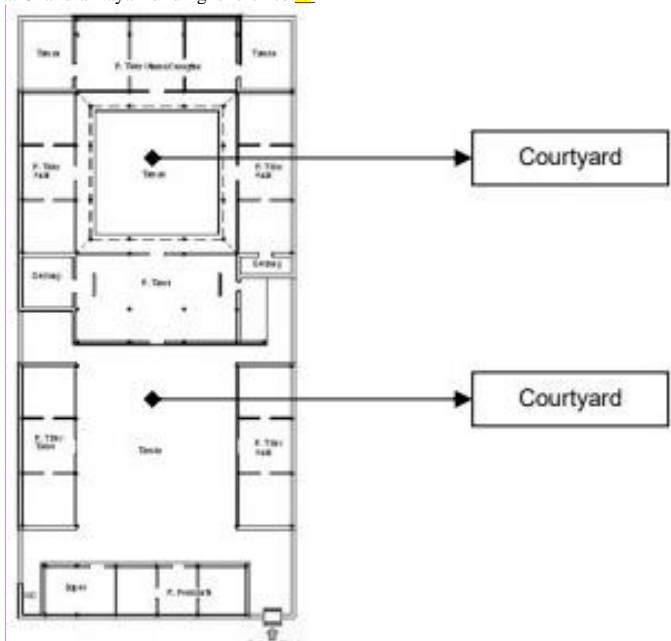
Traditional Chinese Building Floor Plan. (Source: Handinoto, 2008)
